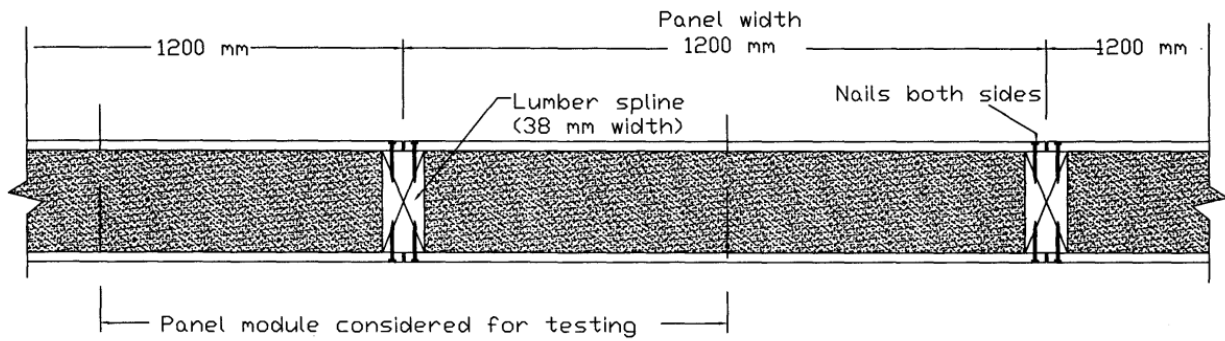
Typical section at panel lumber-spline connection before and after assembly
